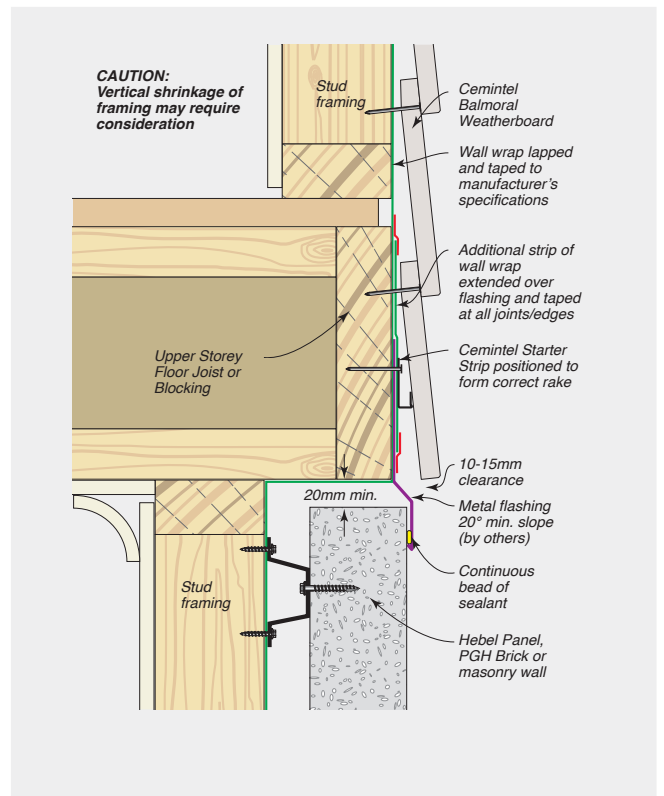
Typical Second Storey Junction with Hebel Panels, Brick Veneer or Masonry Wall – Cantilevered Framing
